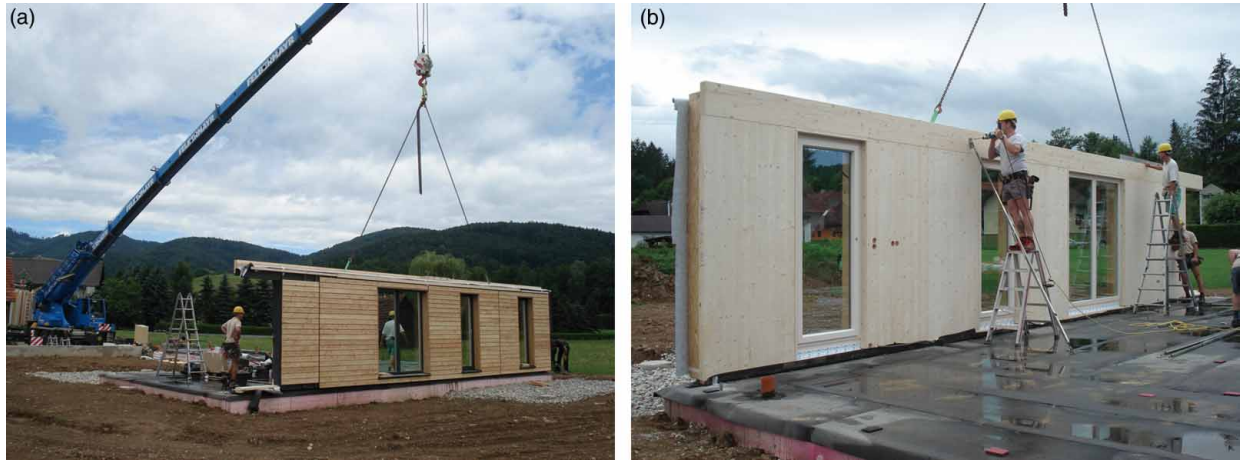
(a) External view of totally prefabricated façade (binderholz X-LAM BBS\_1 © [www.binderholz.com](http://www.binderholz.com)). (b) Internal view of totally prefabricated façade (binderholz X-LAM BBS\_1 © [www.binderholz.com](http://www.binderholz.com)).
